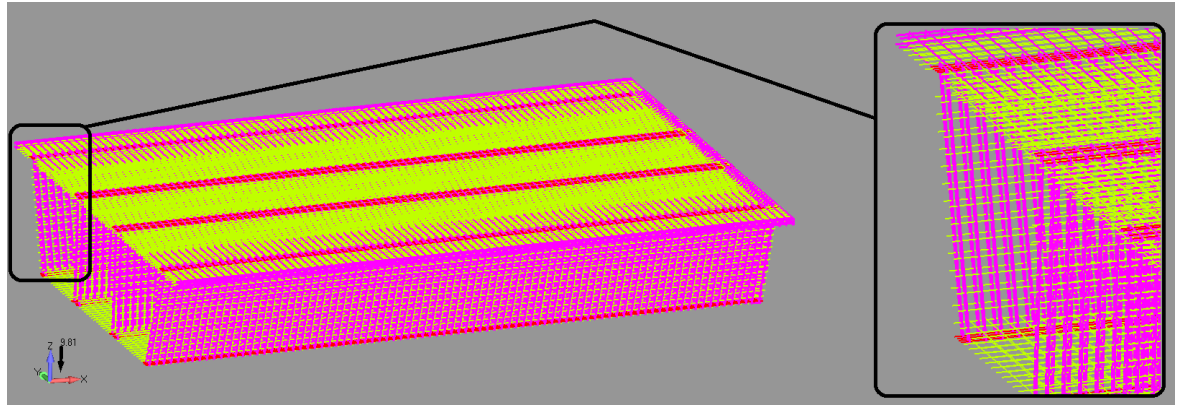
RC Bridge. Macro-element rebar mesh of the opening O2.
